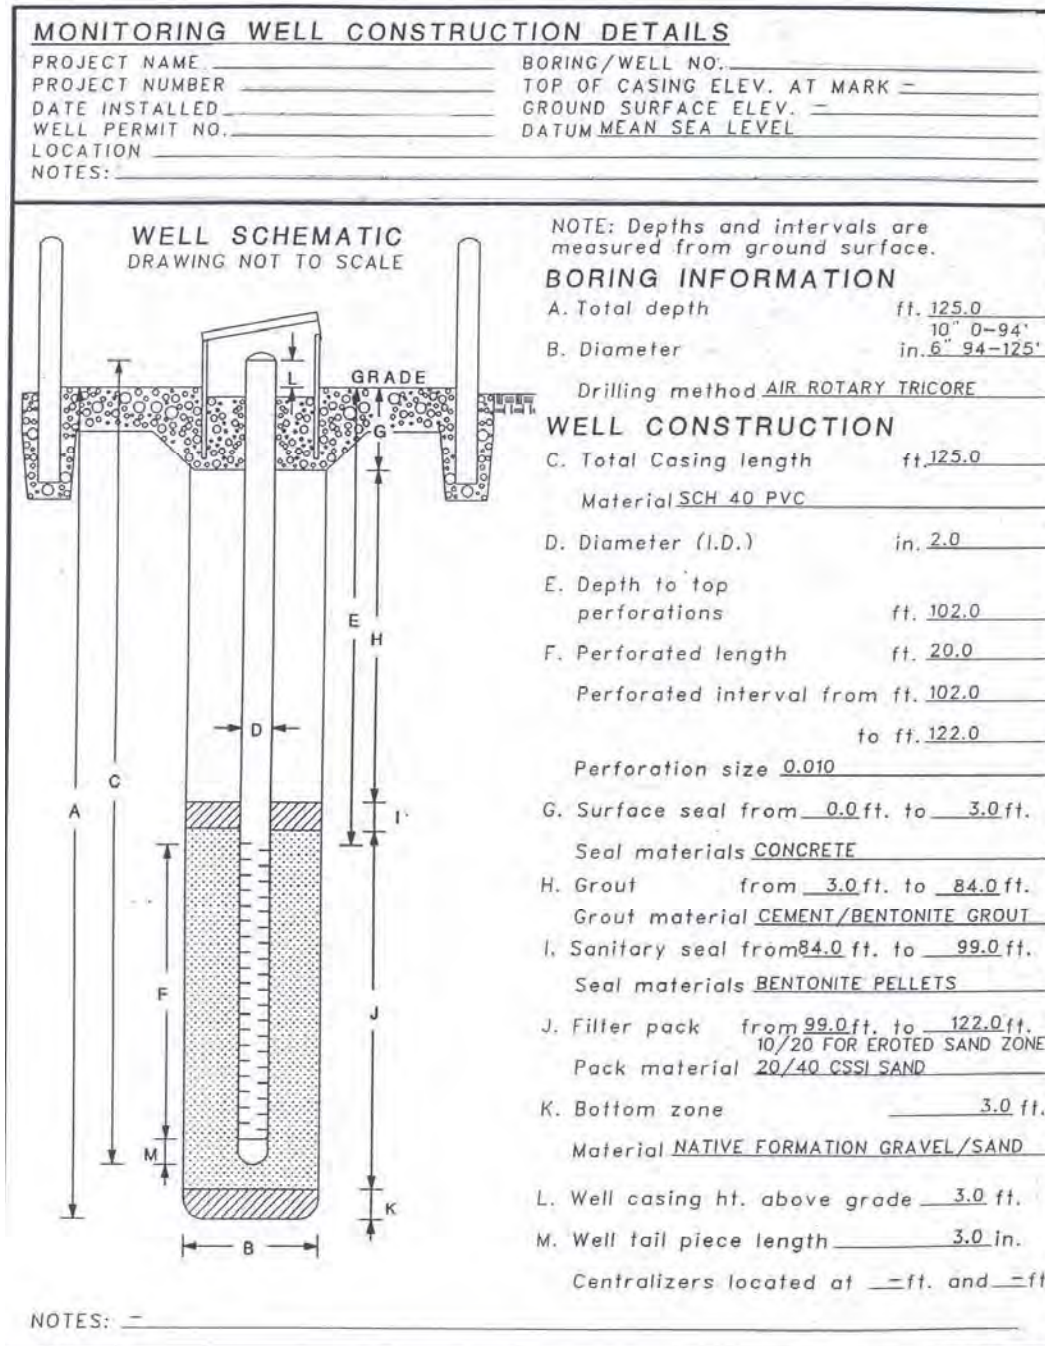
As-built construction details for monitoring well at wastewater land application sites.⁸
